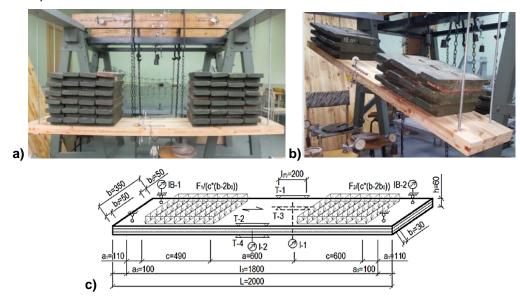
Design scheme and measuring devices placement for suspended CLT panel with four fixing points: a) CLT panel, which was suspended horizontally; b) CLT panel, which was suspended under the angle equal 16.8°; c) scheme of loading and measuring devices placement
